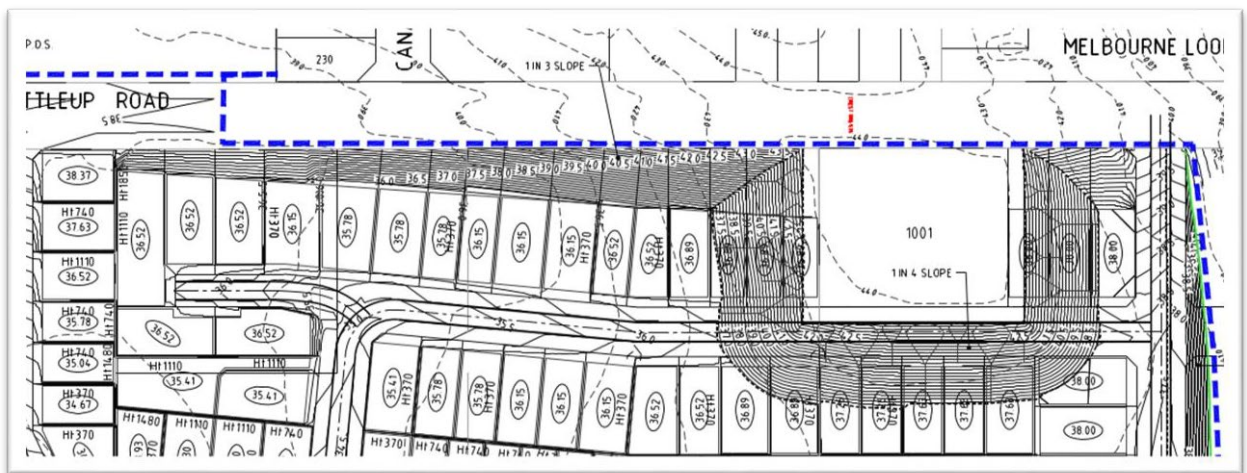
Preliminary Earthworks Plan Extract – Lots Adjacent to Wattleup Road between Access Road 2 and 3
